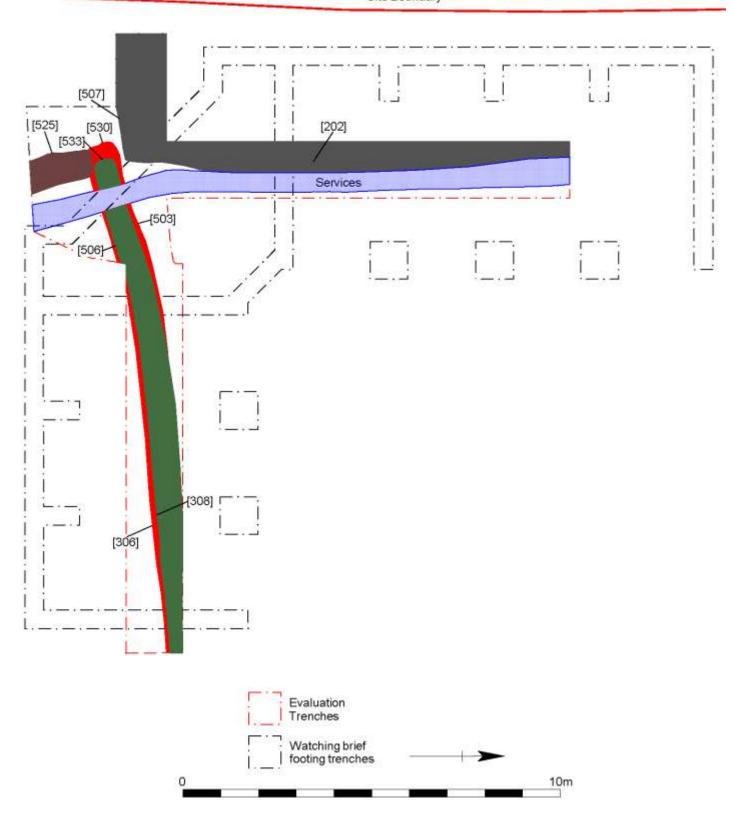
Footing trenches in relation to known archaeological features (scale 1:100)
